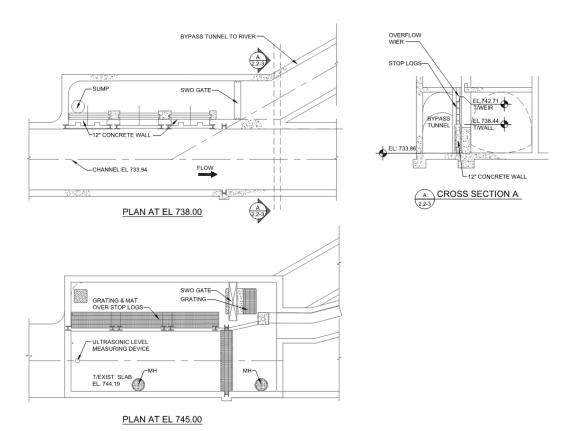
Regulator R06 Chamber Plan & Section Views
